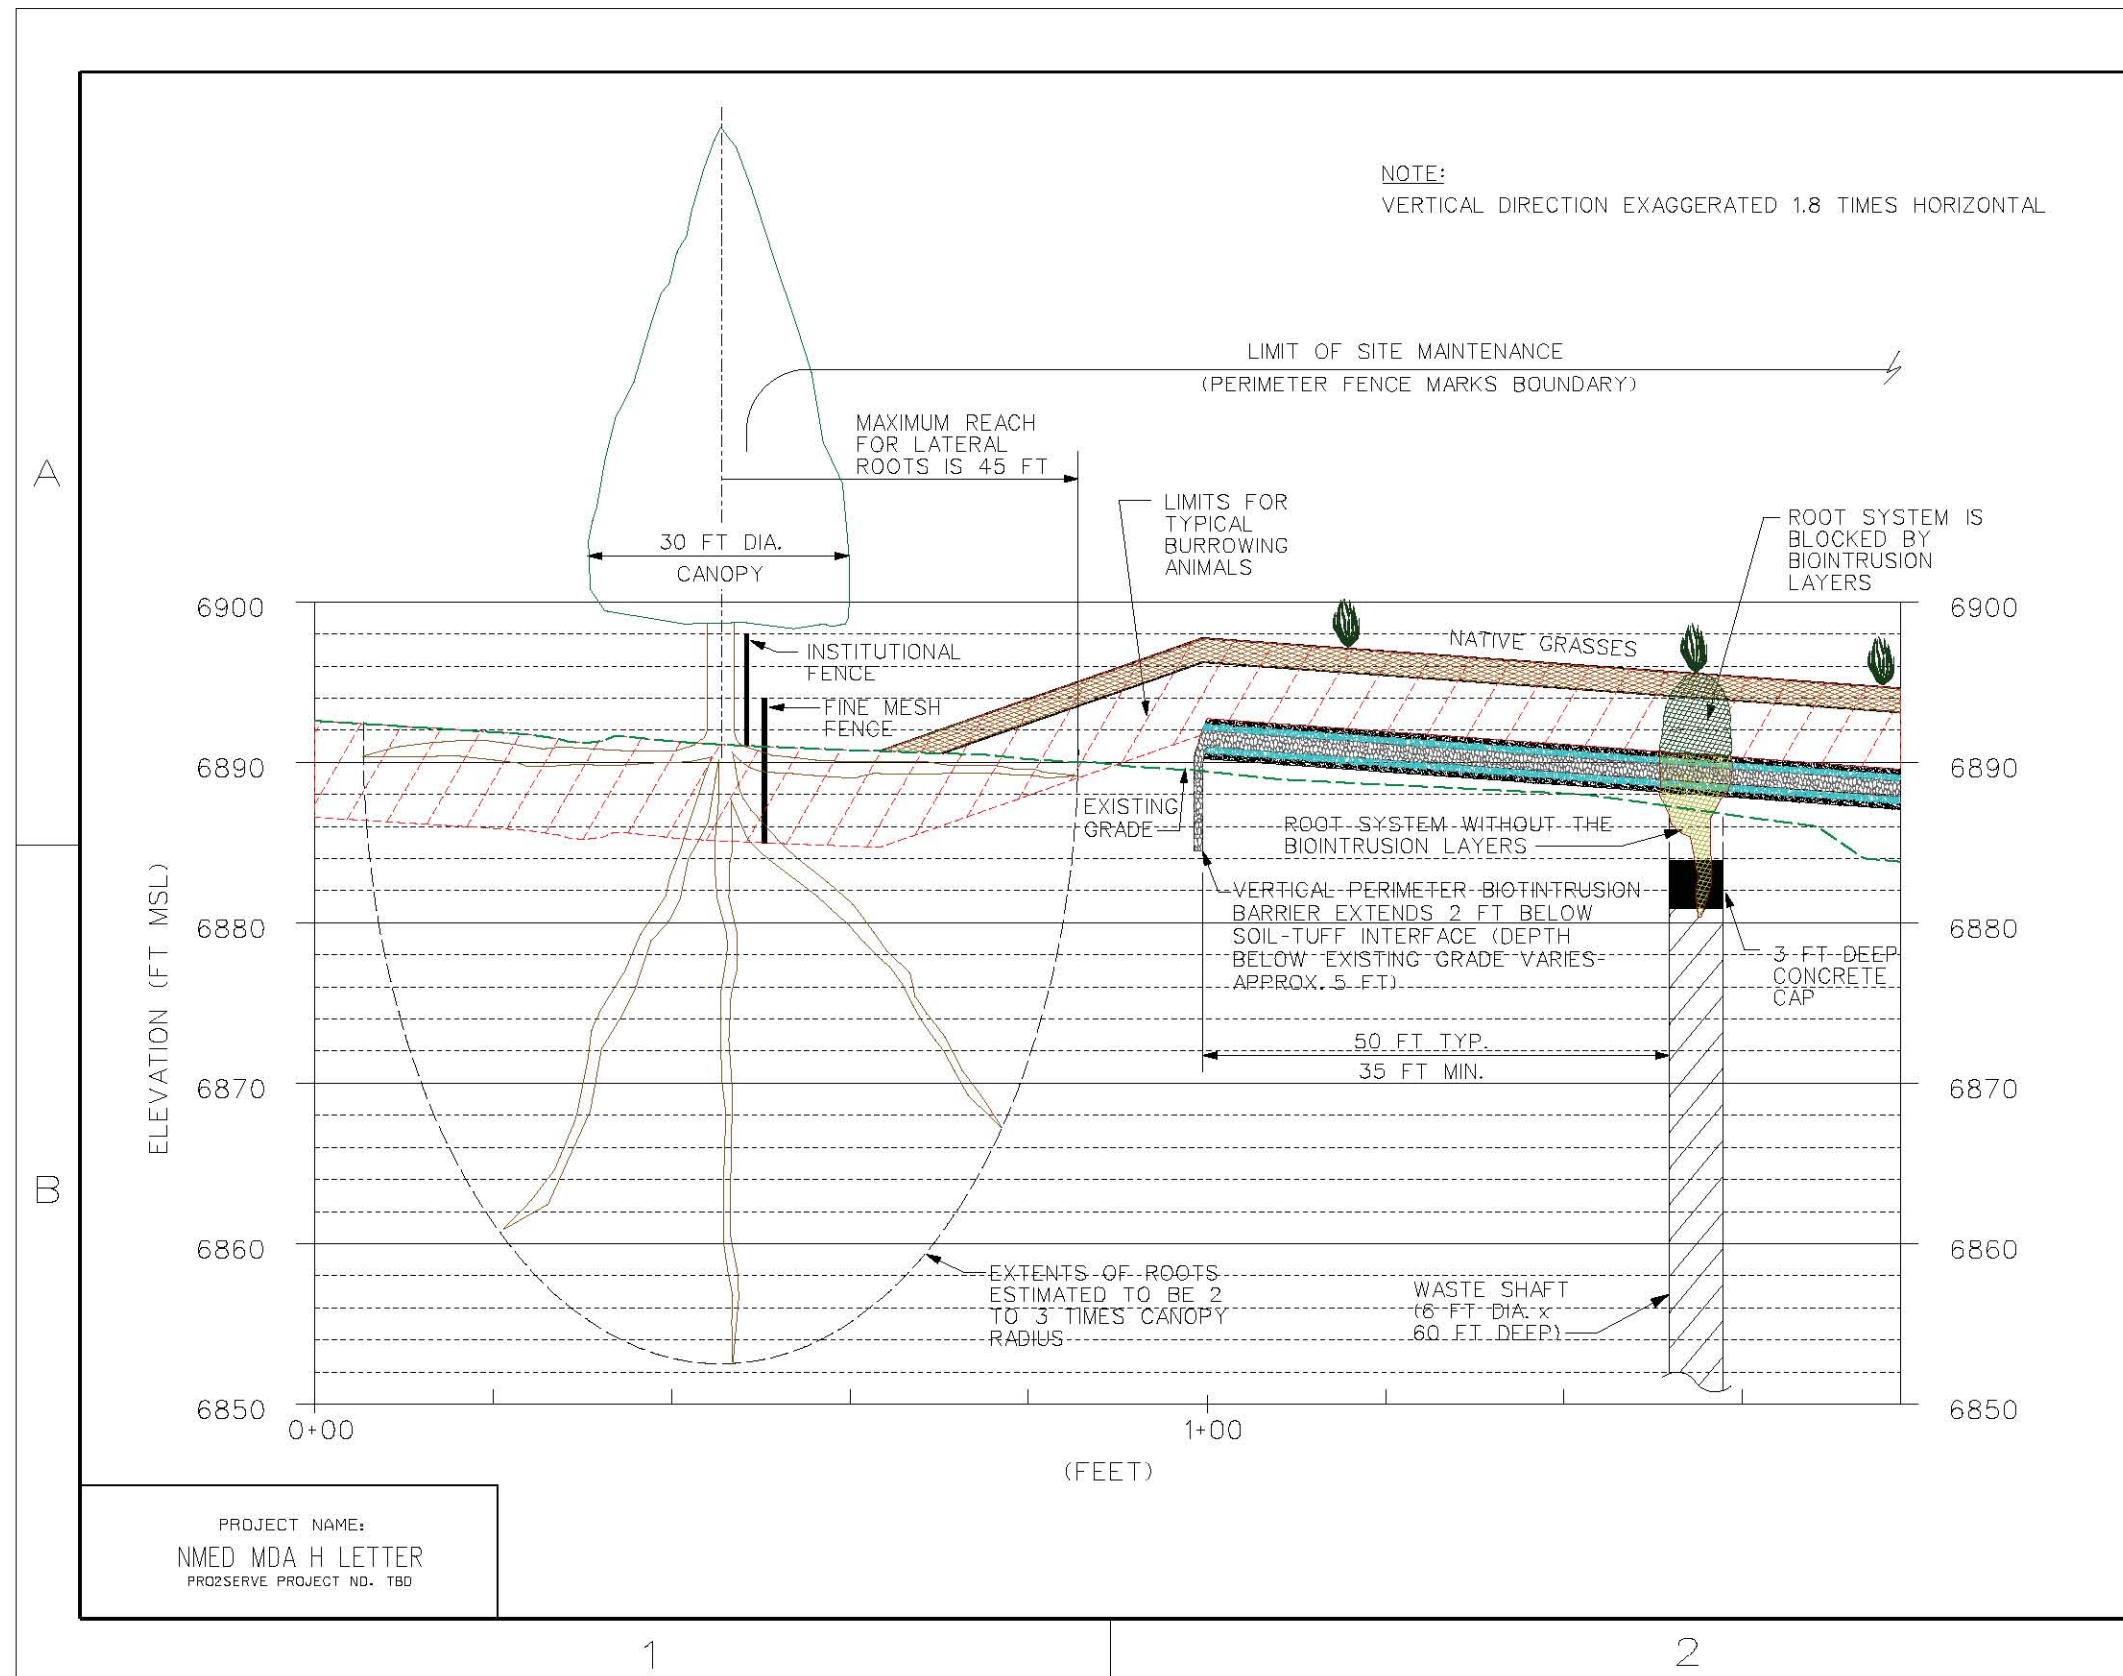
Cross-section of the trench below the soil-tuff interface
